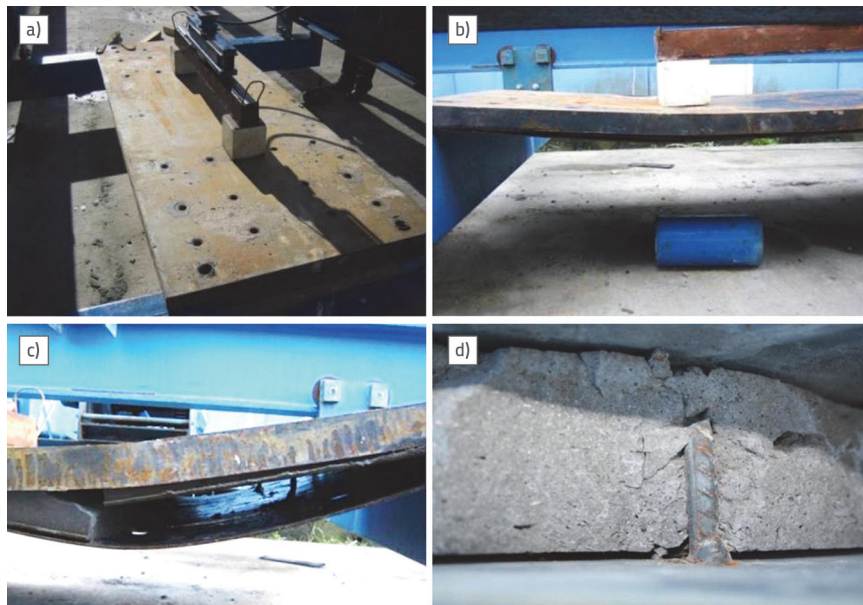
Static four-point plate bending test of the composite panel: a) initial loading stage; b) local buckling of the top compression plate; c) detachment from the compression plate, crushing of the top of concrete core followed by its failure under excessive bending; d) bearing of the concrete core onto the shear stud welded on to the tensile plate
